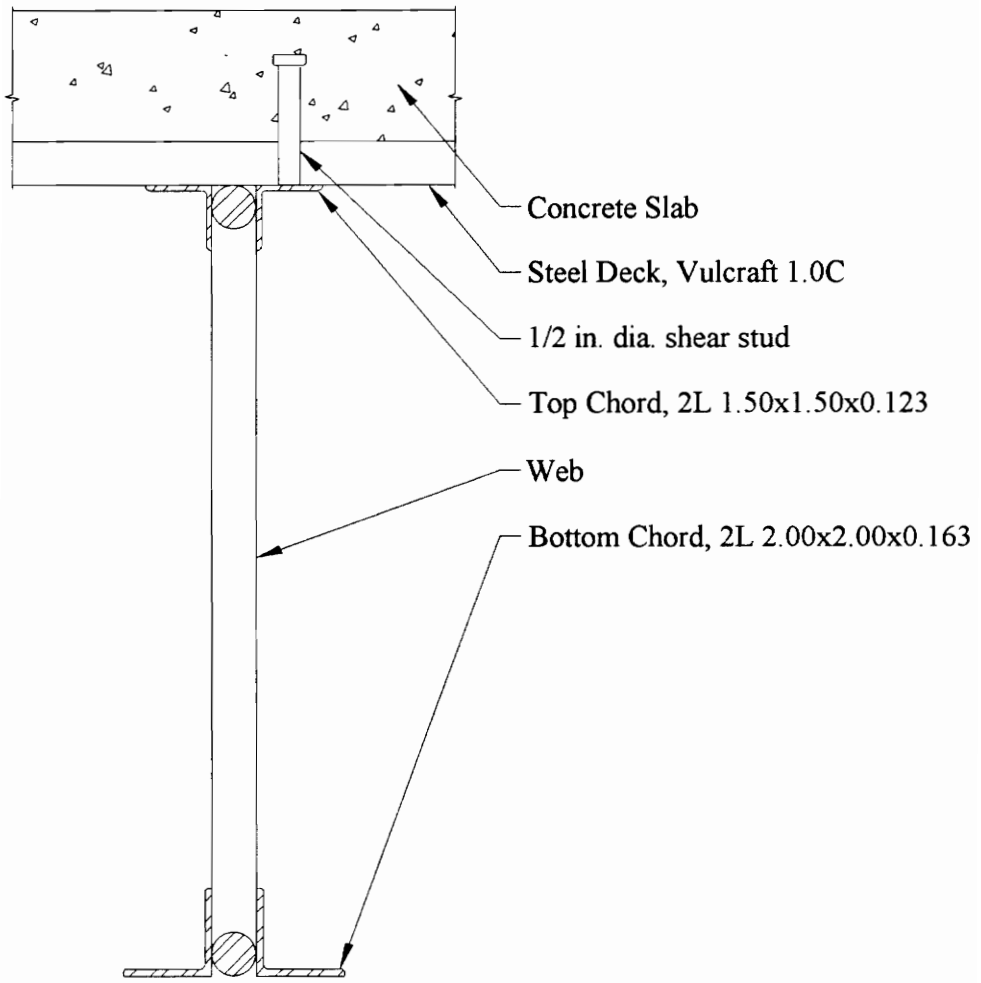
CSJ-6 and CSJ-7 Joist Cross-Section
